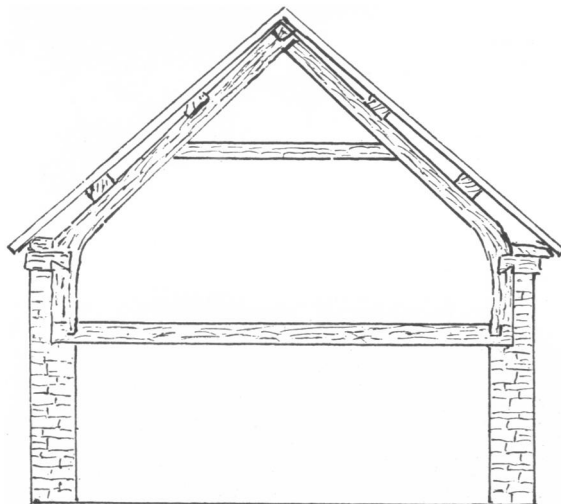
SECTION OF A STONE HOUSE OF c. 1575 WITH UPPER-CRUCK CONSTRUCTION
